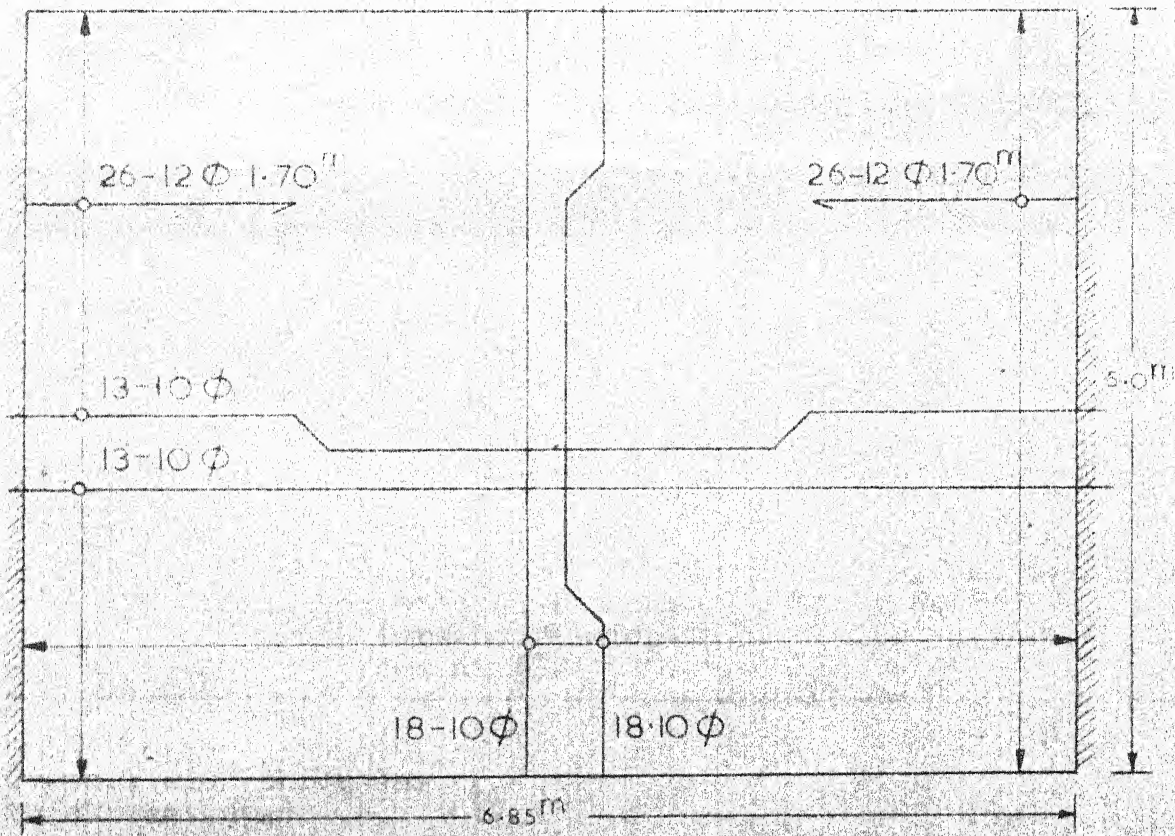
REINFORCEMENT LAYOUT FOR EXAMPLE 7.3
